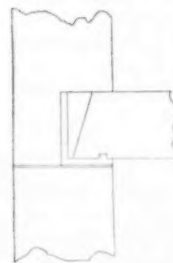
Goetz-Mitchell Beam-block: Beam in Wall.
